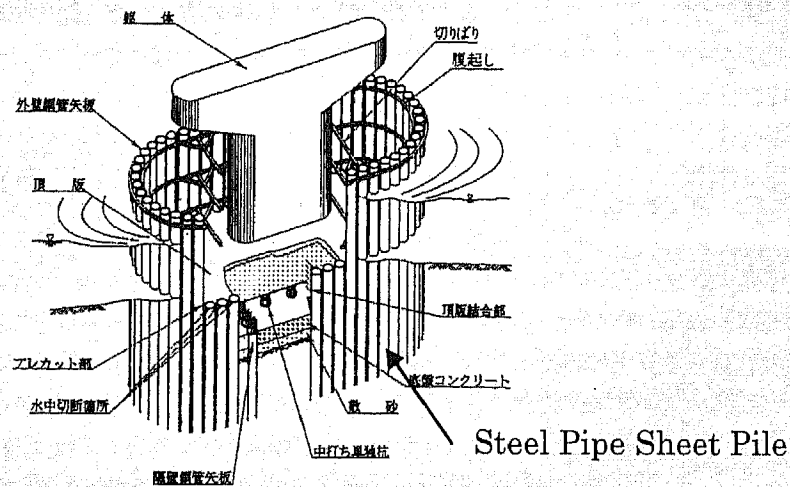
Schematic View of Steel Pipe Well Foundation
